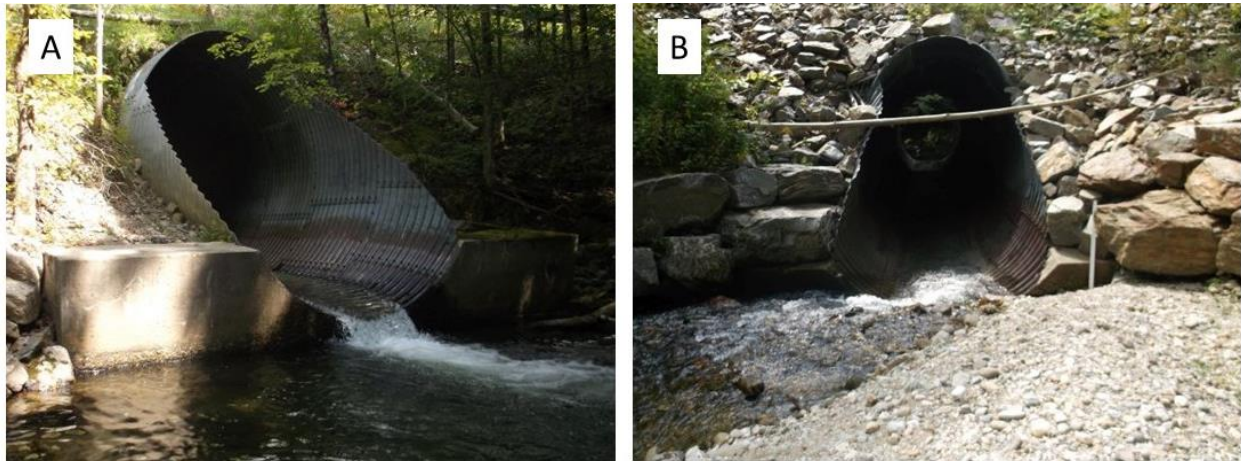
Culvert conveying Baldwin Creek under VT Route 17: A) downstream culvert outlet; B) upstream culvert inlet.
